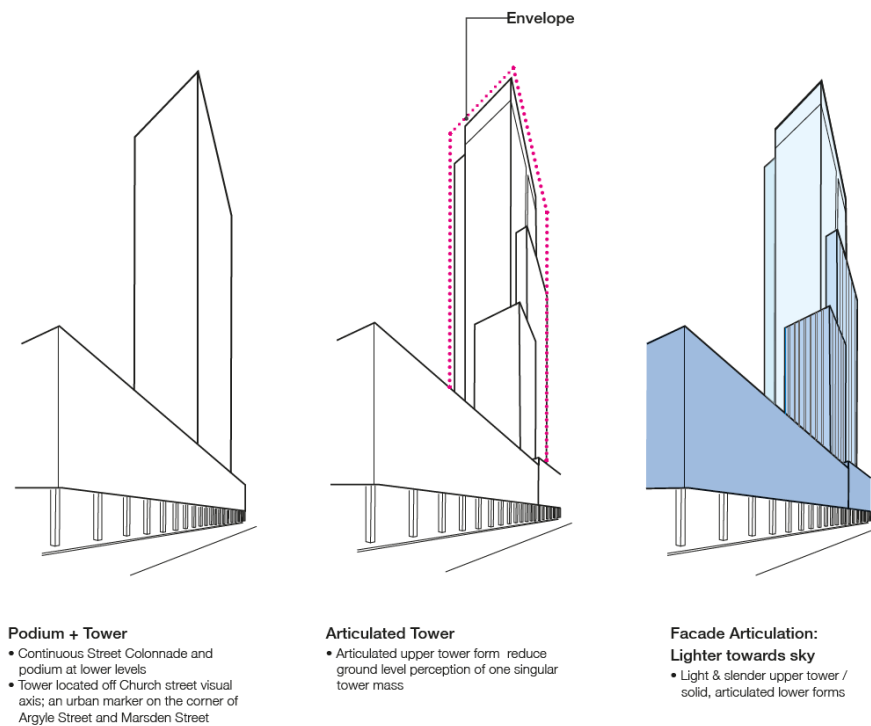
Proposed design response to the development of the tower form and articulation. (Woods Bagot, 2020)
